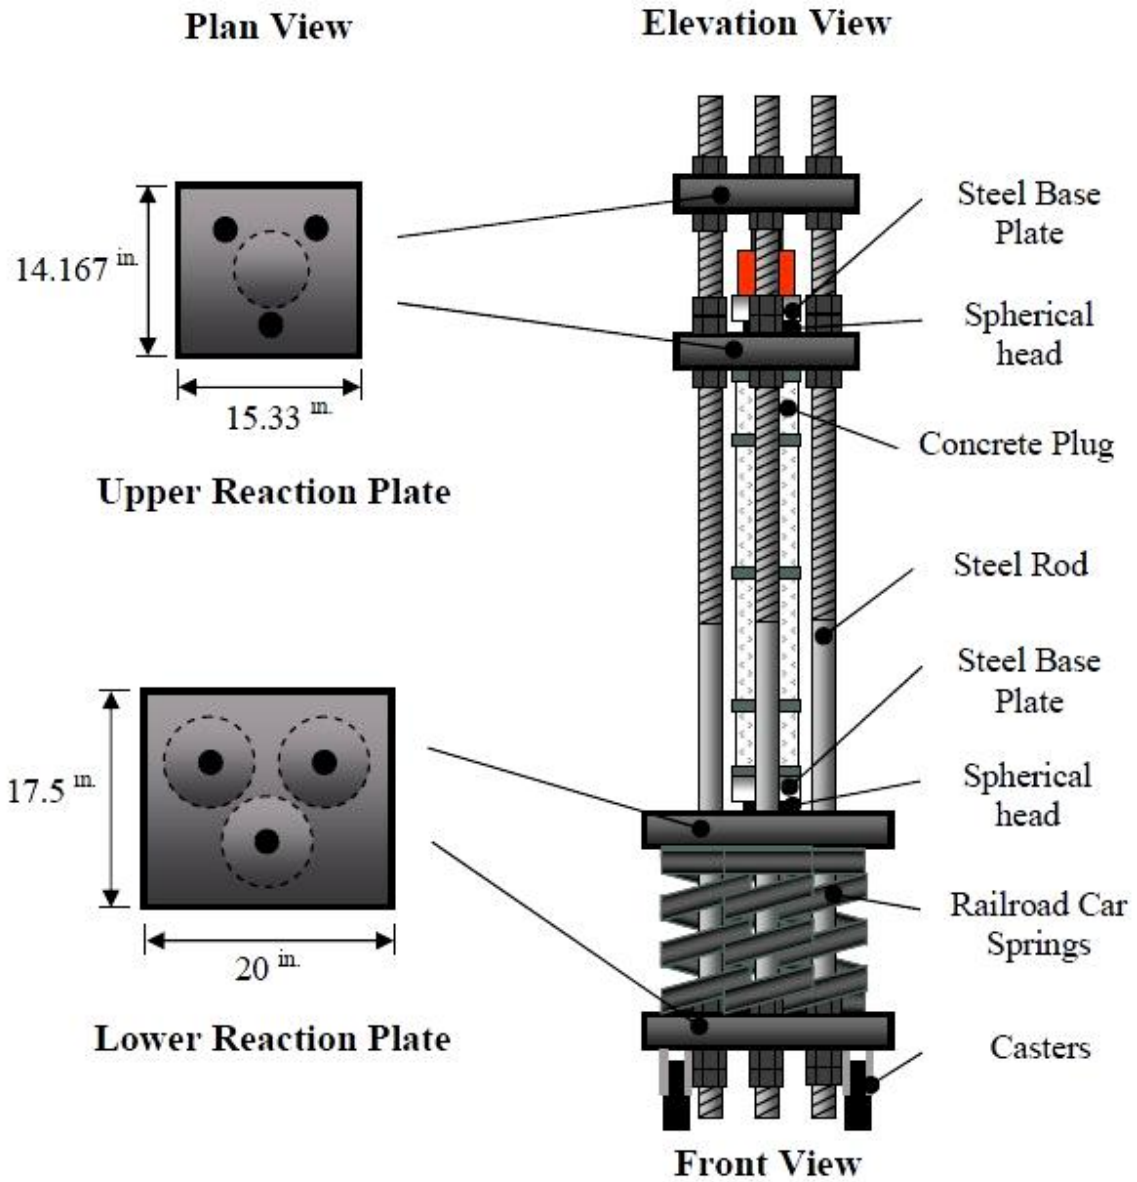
Plan Views of Reaction Plates on Creep Frame (Kavanaugh 2008)
